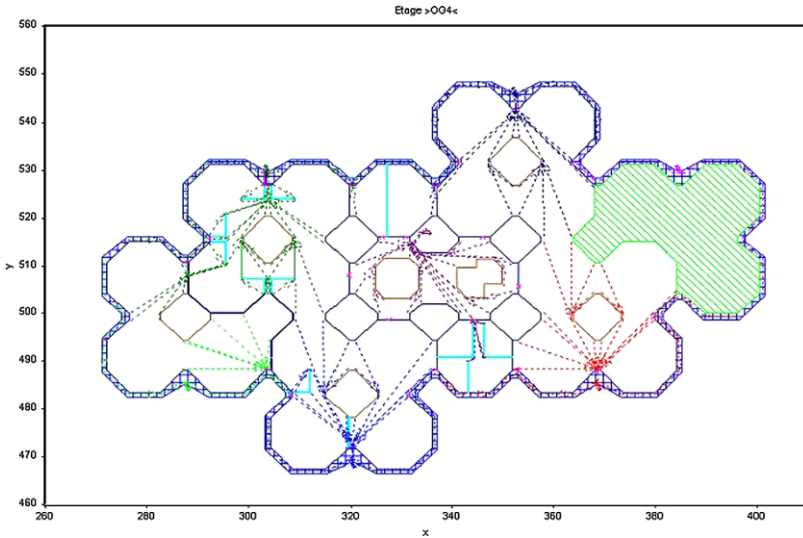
Egress routes inside the floor of a multi-storey office building.
